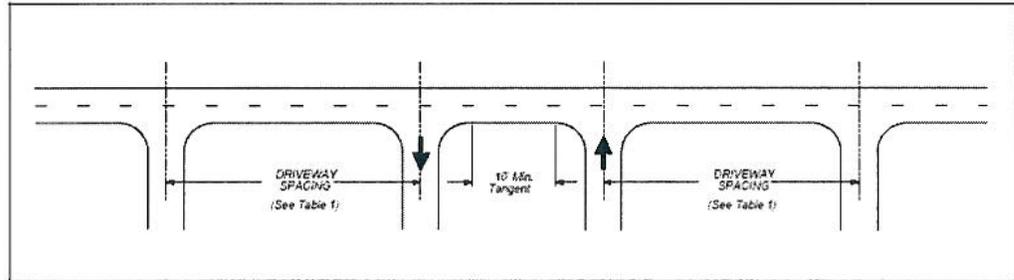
Spacing Criteria for One-Way Driveways
